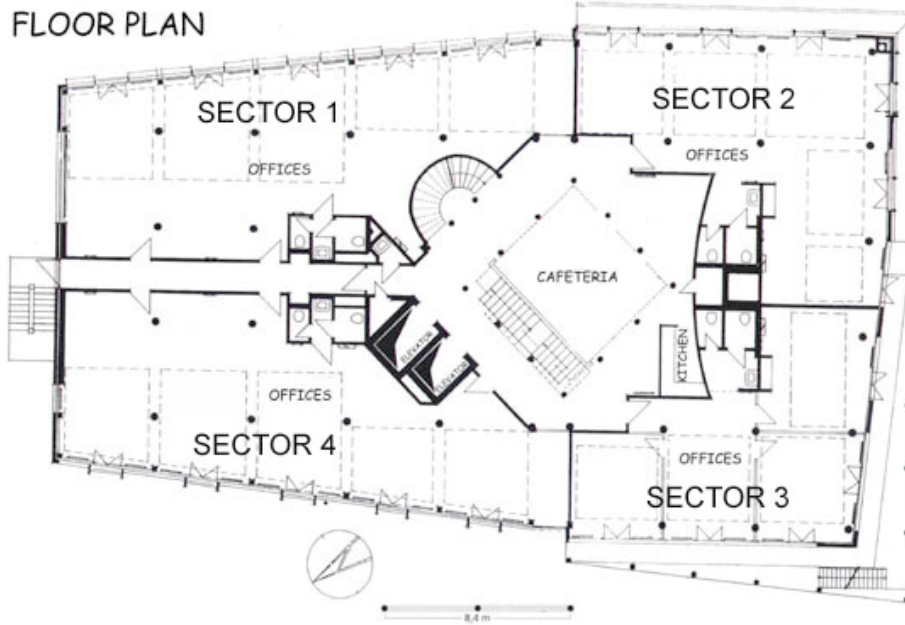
Tenem Floor Plans (Tenem AG, 1996:6-7)
